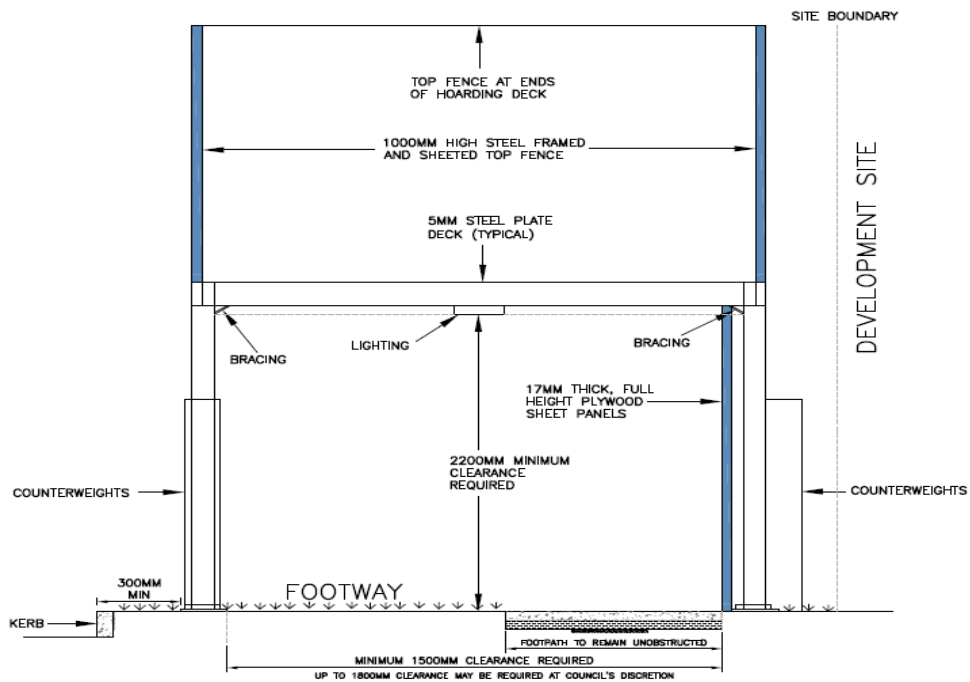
Diagram of Typical Cross Section for Type B Hoarding with concrete Footpath and grass verge
